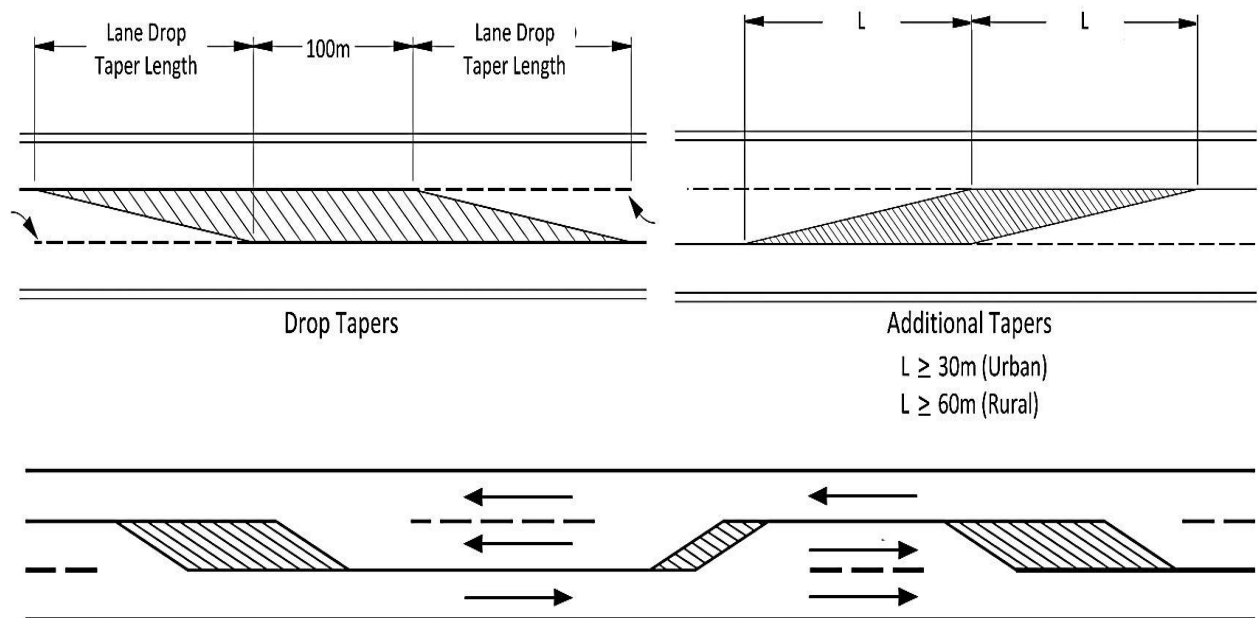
/3: Schematic for 2 + 1 Roadway [1, p.3-136]
